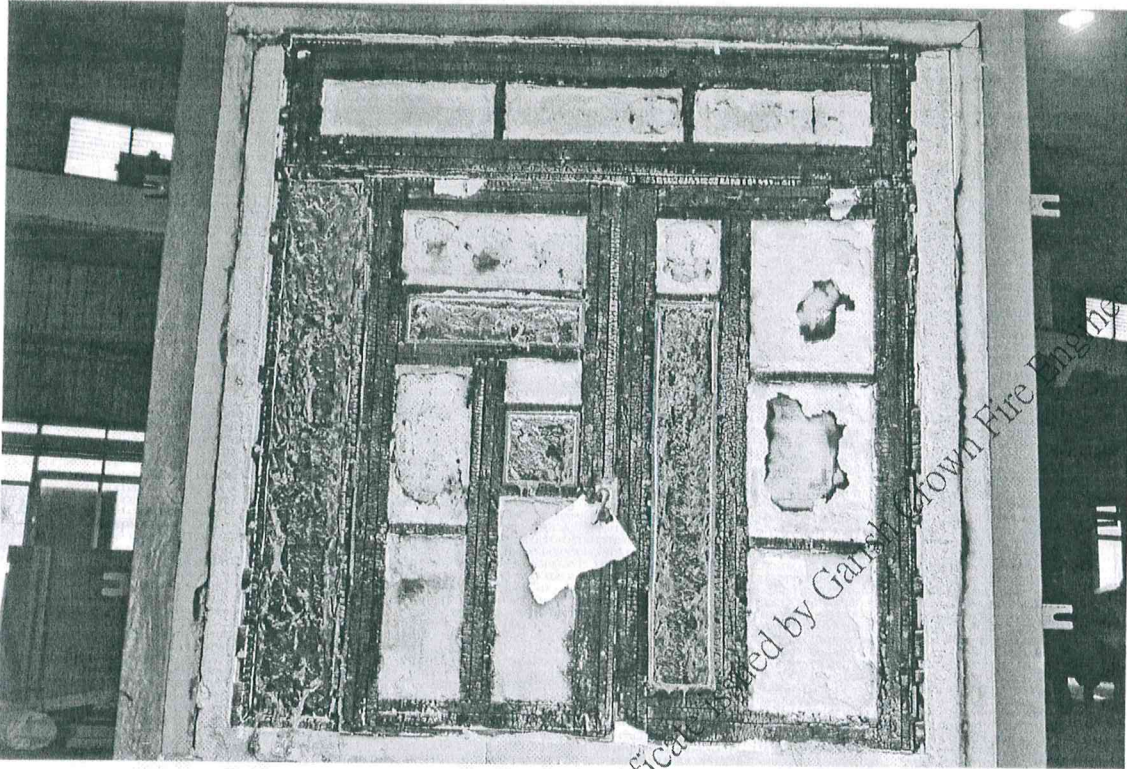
Unexposed surface of the specimen at 30 minutes of test.
